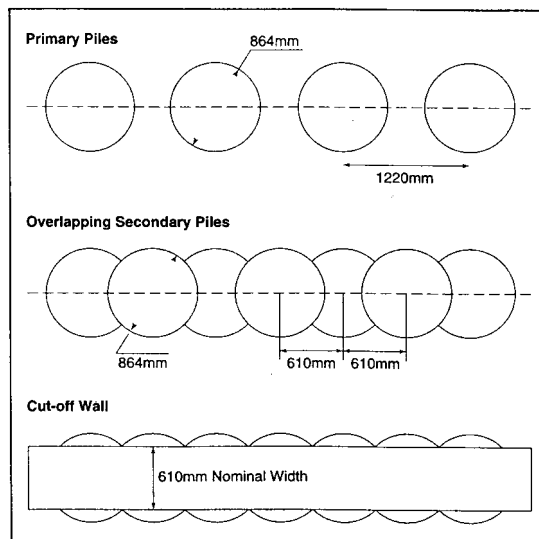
Beaver dam: Pile arrangement and construction sequence
